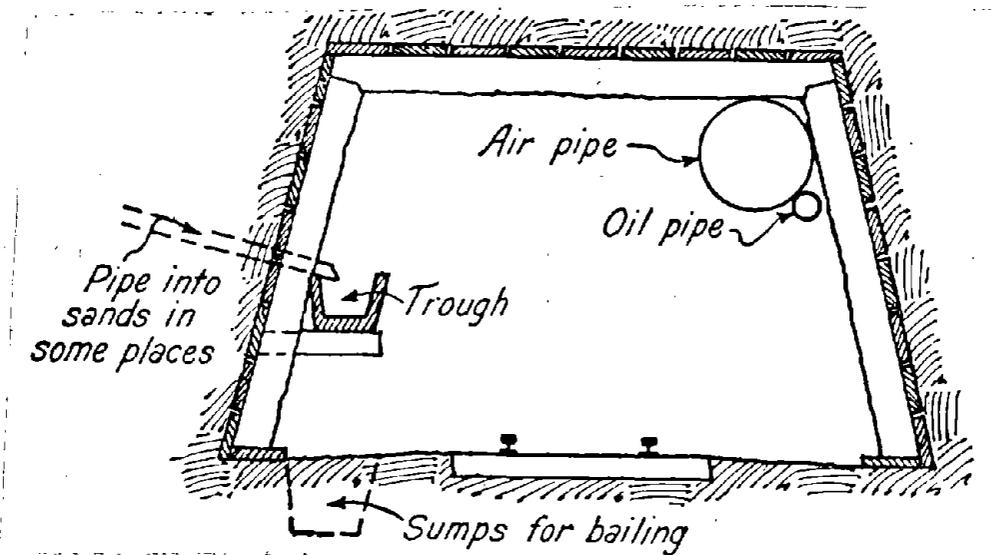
Cross section of heading of an oil-draining gallery at the Wietze mine (USBM Bull. 351, p. 57).
